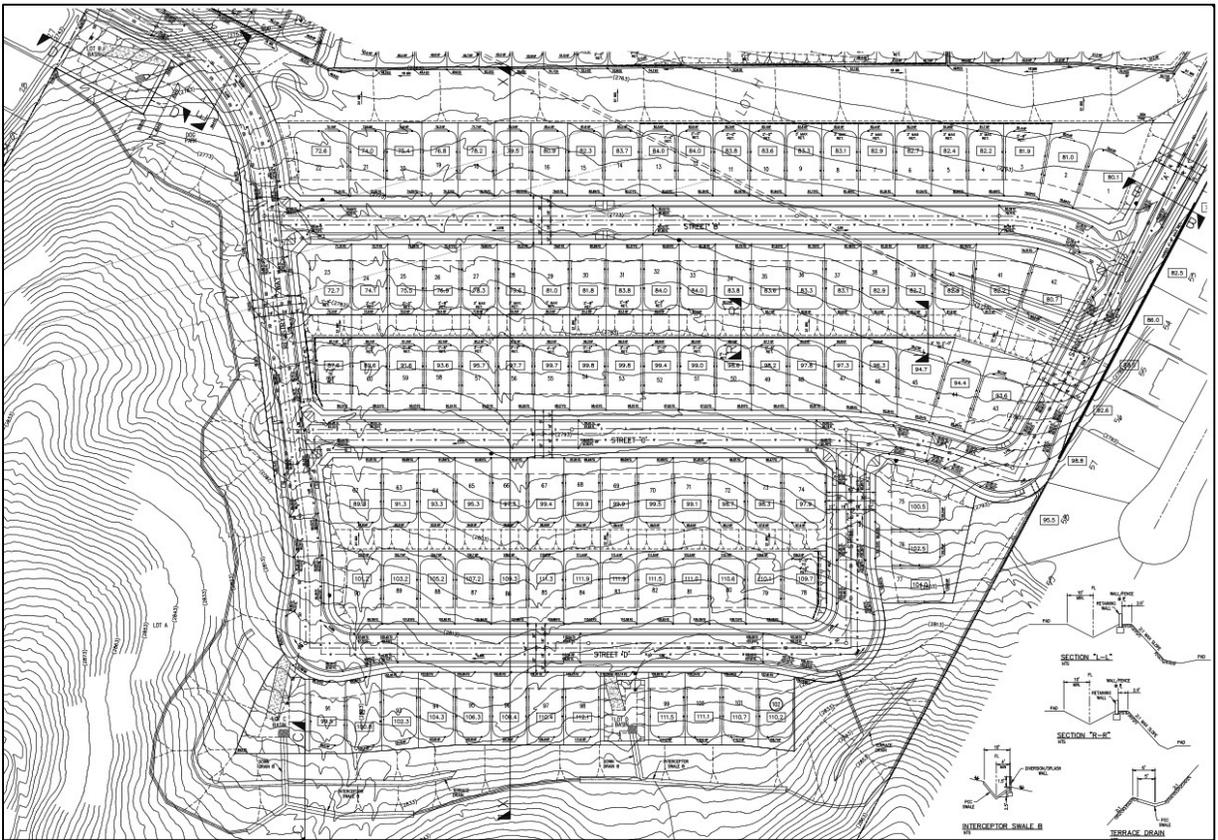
Site Plans – Proposed Development – Palmdale, CA
